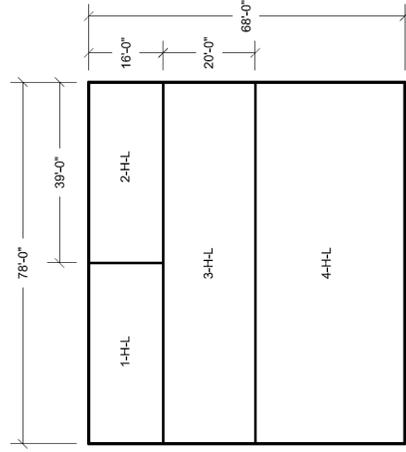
H.6-58: PUMP HOUSE EAST WALL LOOKING WEST
